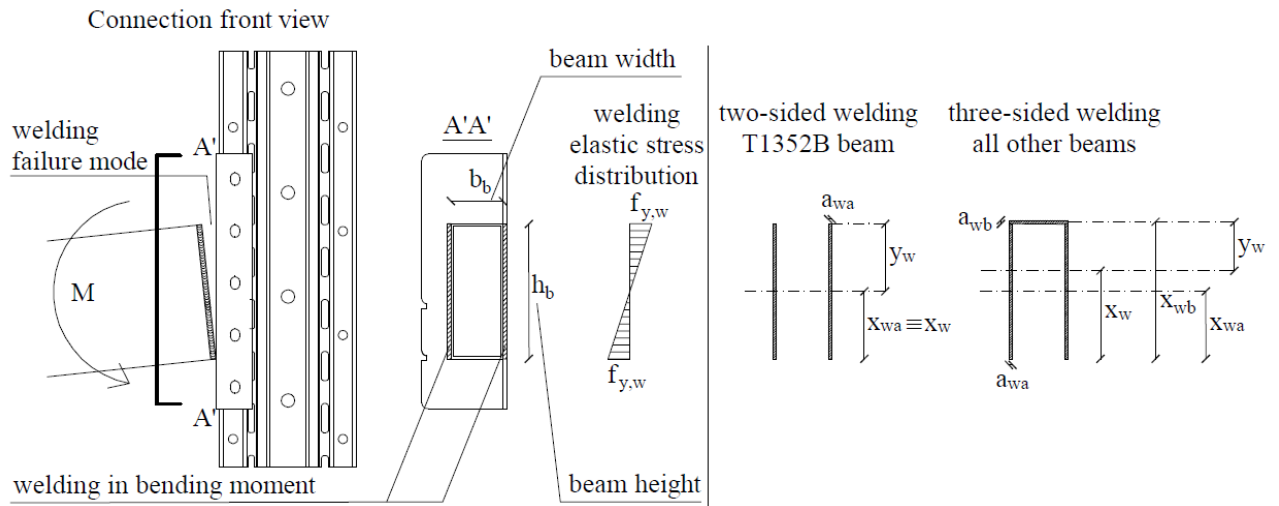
Failure model of welding in stress (B type of welding).
